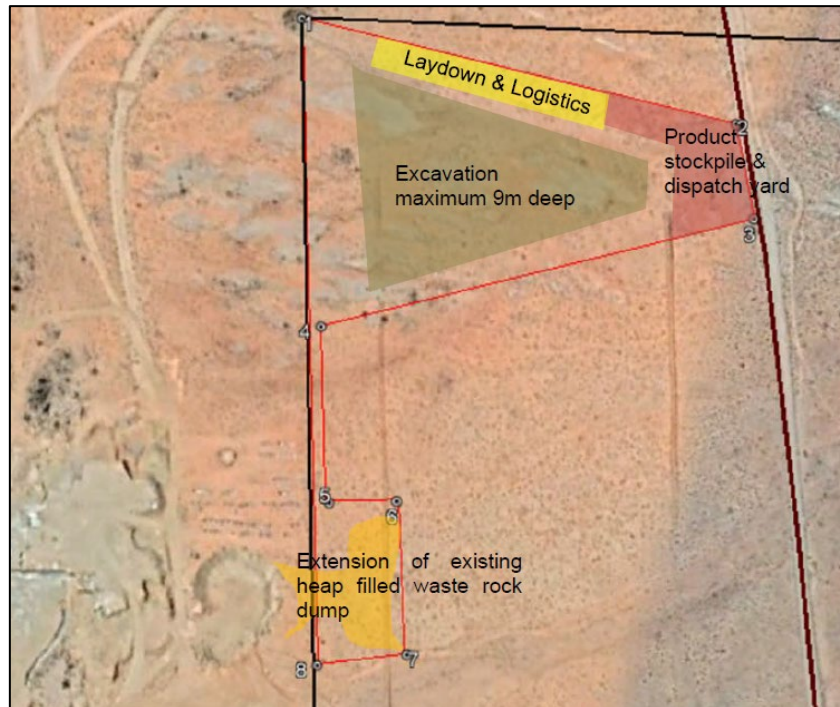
Plan of the proposed mine adjacent to the existing granite mine.
